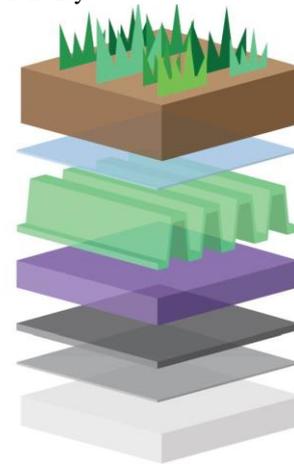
The seven layers of the green roof, excluding the structural roof: (from bottom to top) waterproofing sheet, root barrier, retention sheet, drainage layer, filter layer, substrate, vegetation [20].
